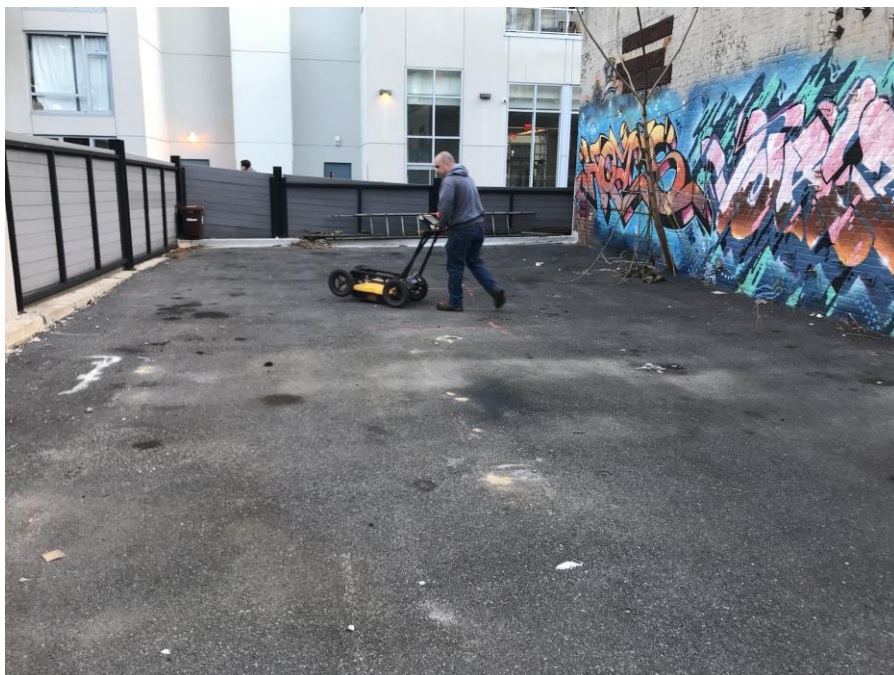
, 11/20/2017: NOVA performing a ground-penetrating radar survey over the the potential underground storage tank location, facing northeast.
